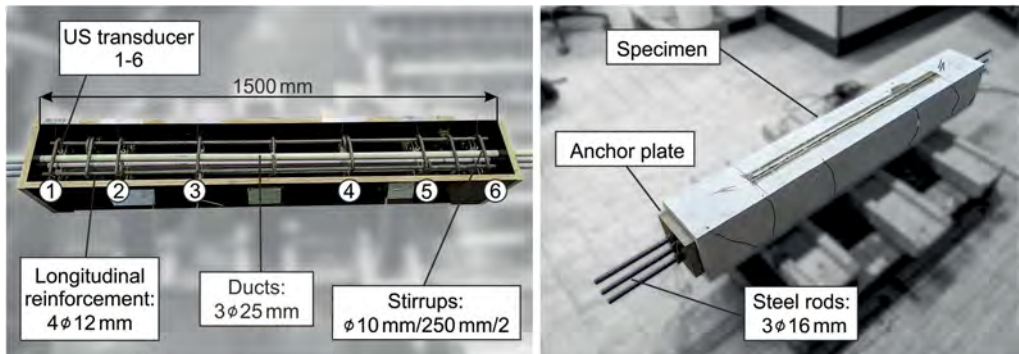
Test specimen of an unbonded post-tensioned beam before (left) and after (right) concreting.
